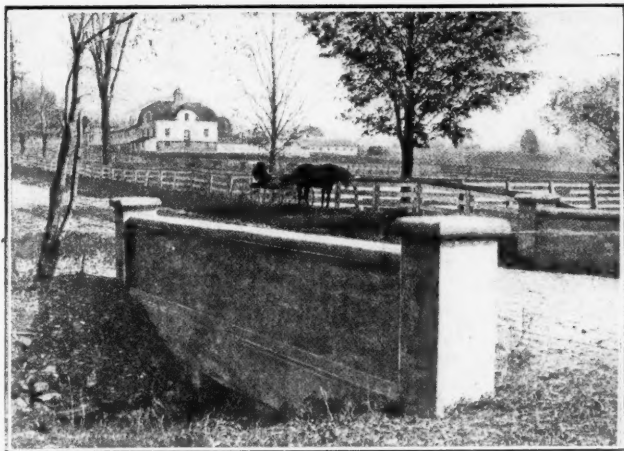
REINFORCED CONCRETE BOX CULVERT AT LENOX, MASS.
